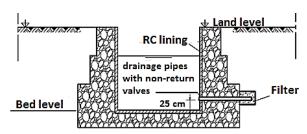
Using walls of the rubble with cement mortar to form the canal cross-section
